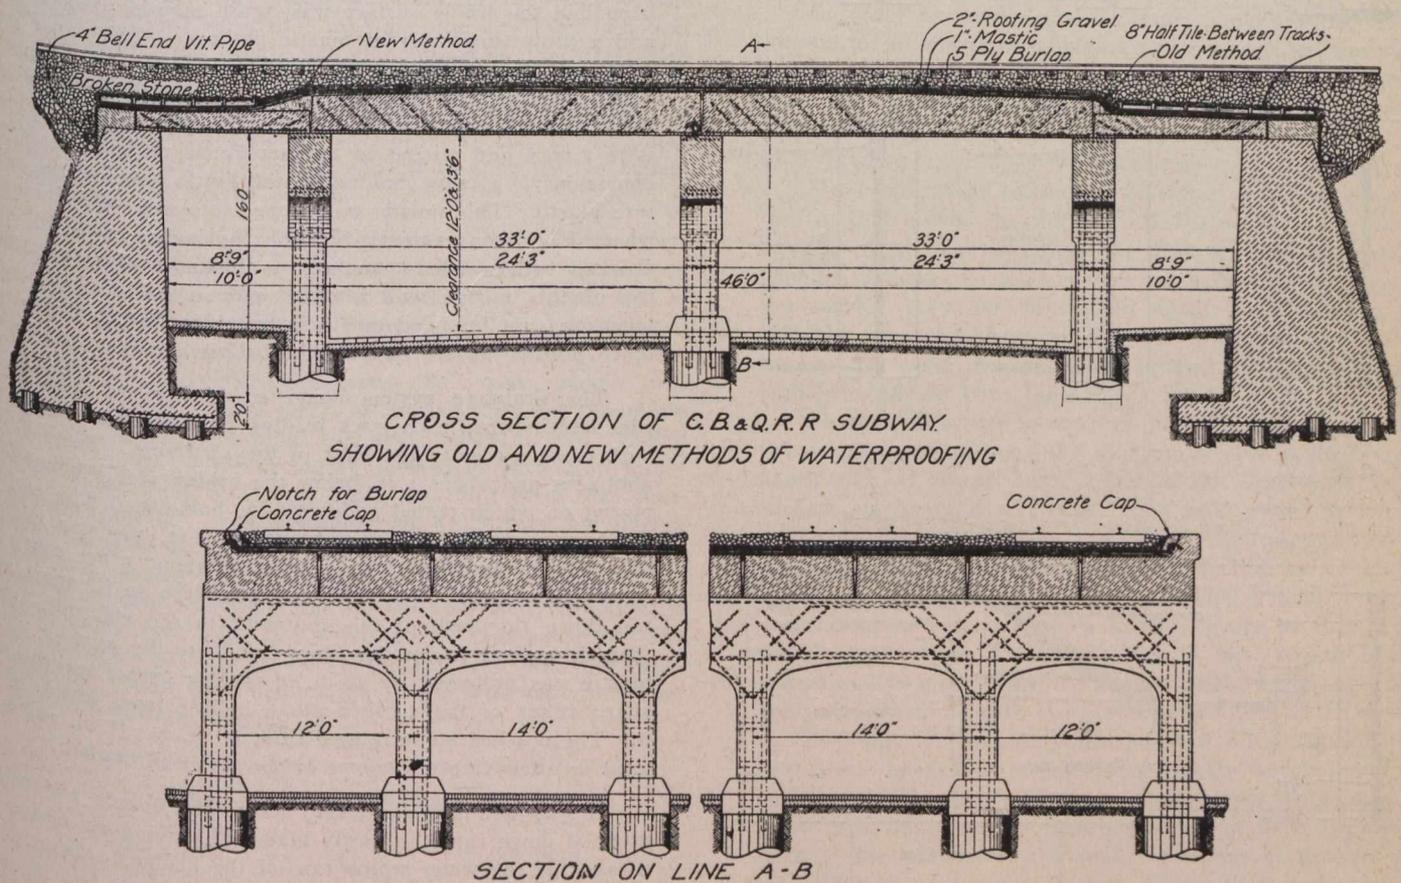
Standard Method of Waterproofing Subways; C. B. & Q. Track Elevation Work, Chicago.
